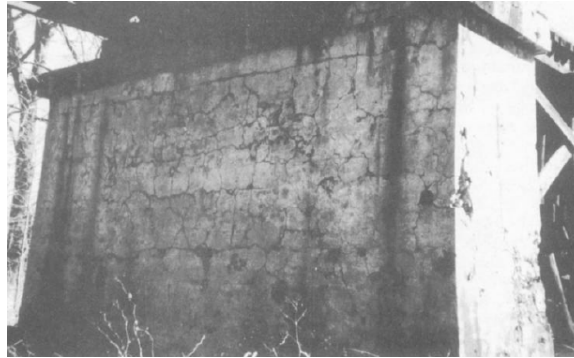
Map cracking in a pier (Army and Air Force 1994).
